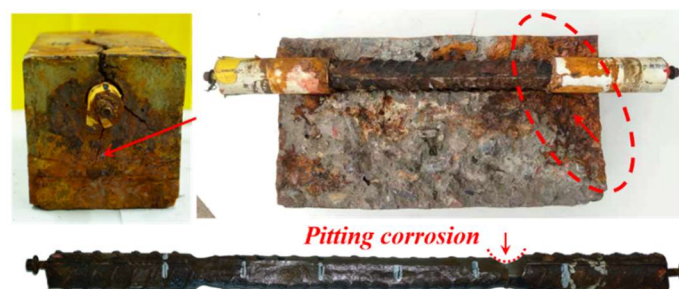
The corroded specimens and the phenomenon of pitting corrosion.
